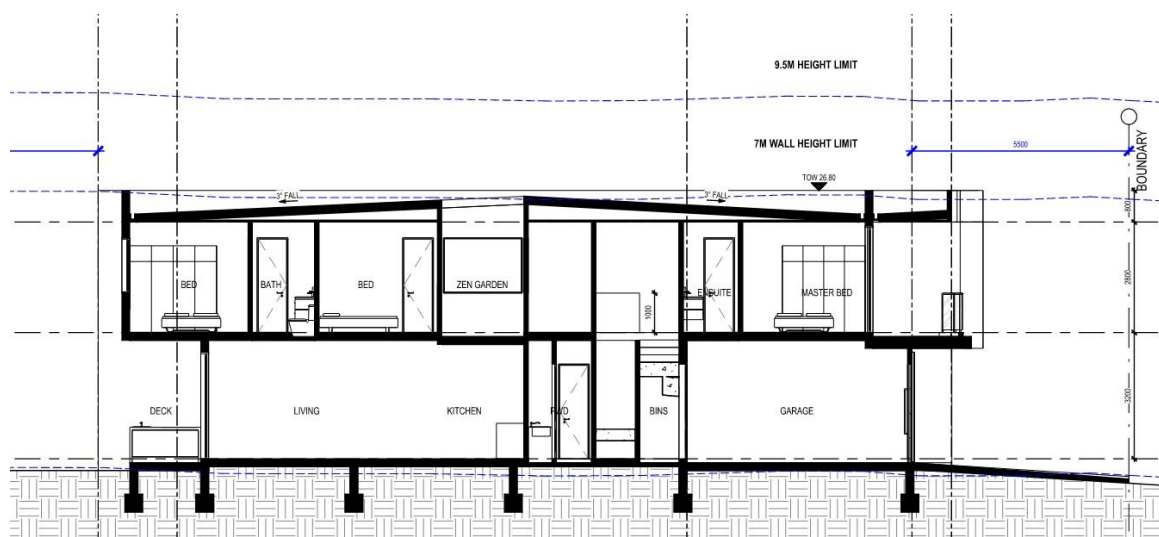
Long-section of No.6-6B Chester Avenue (Source: DA/64/2023)
